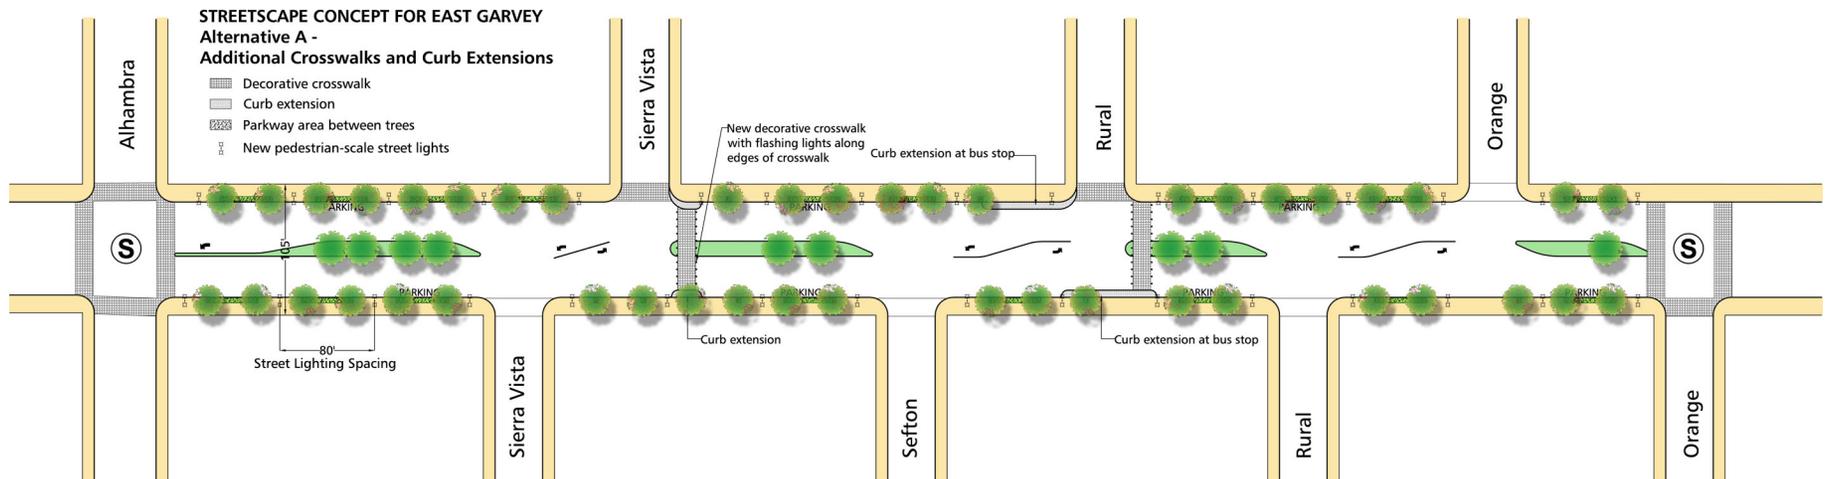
East Garvey Avenue streetscape concept, Alternative A.
